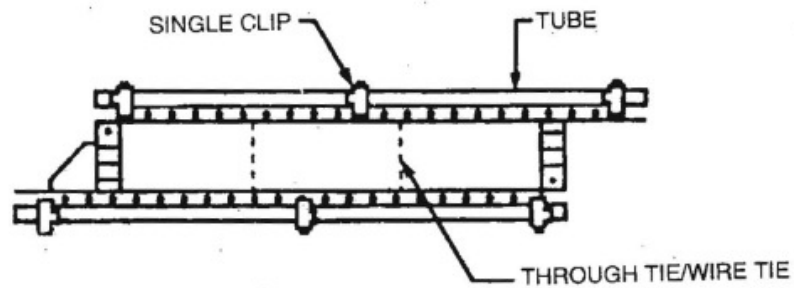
Typical Arrangement of Column Form Work (Clause 5.2.3.2)
